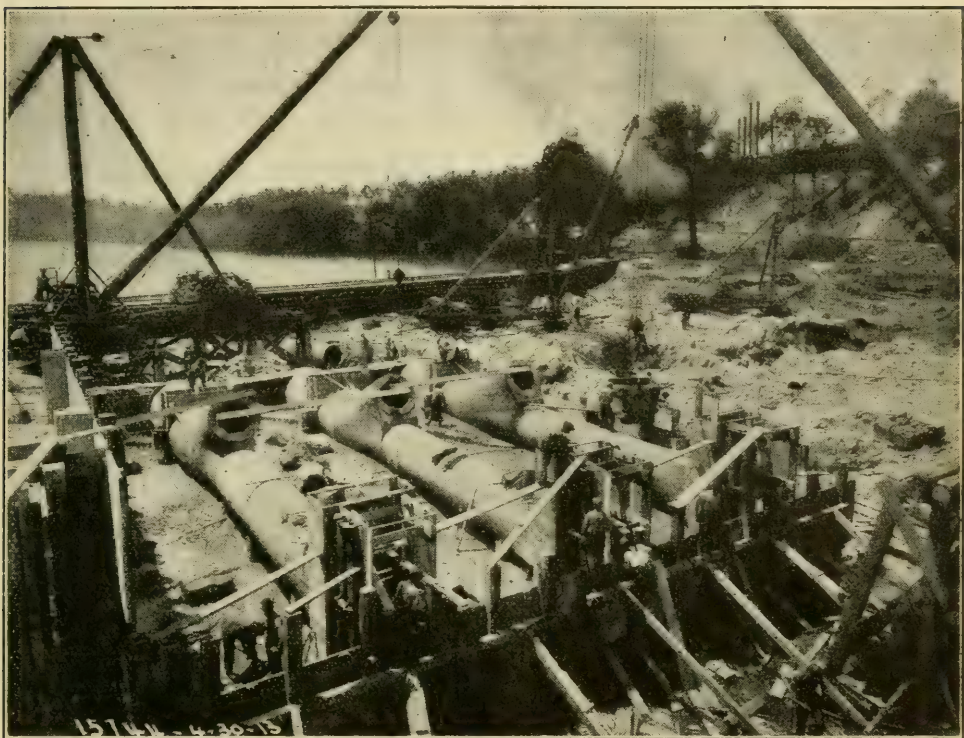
FORMS FOR WASTEWAY OR BLOW-OFF CULVERTS.
